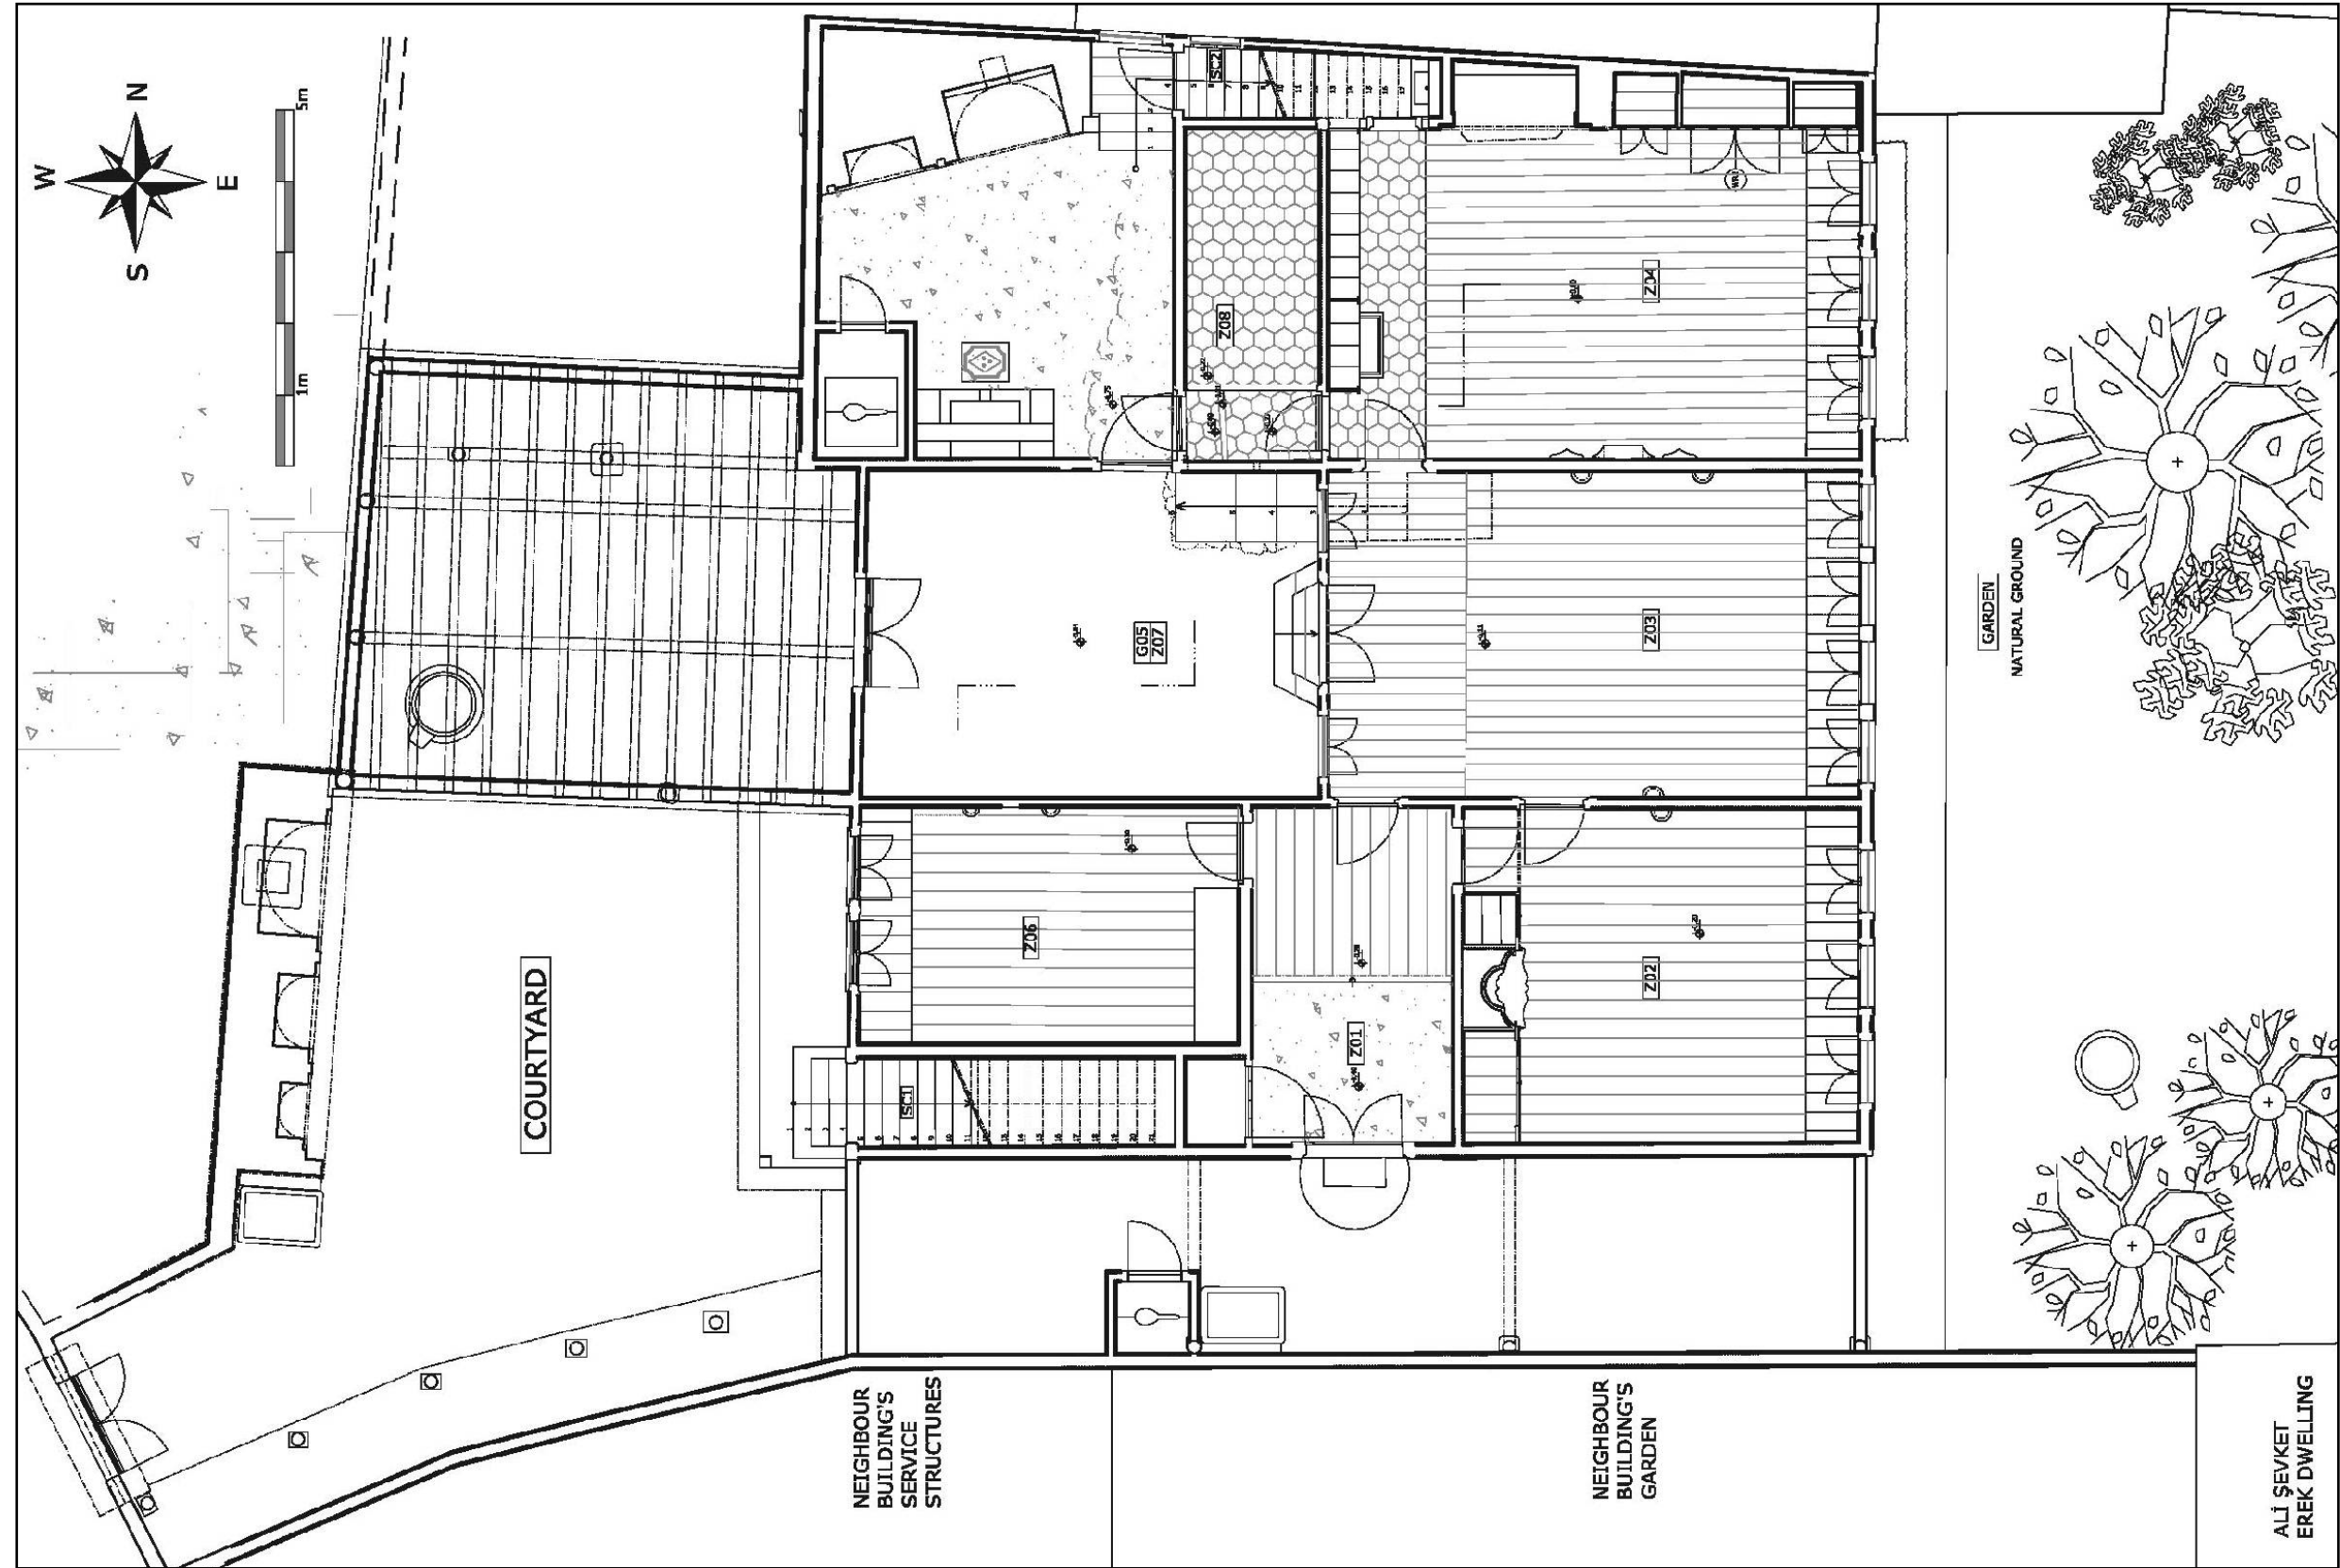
Restitution Phase II – Ground Floor Plan: 1/100 (Presented in 1/50 at Jury)
